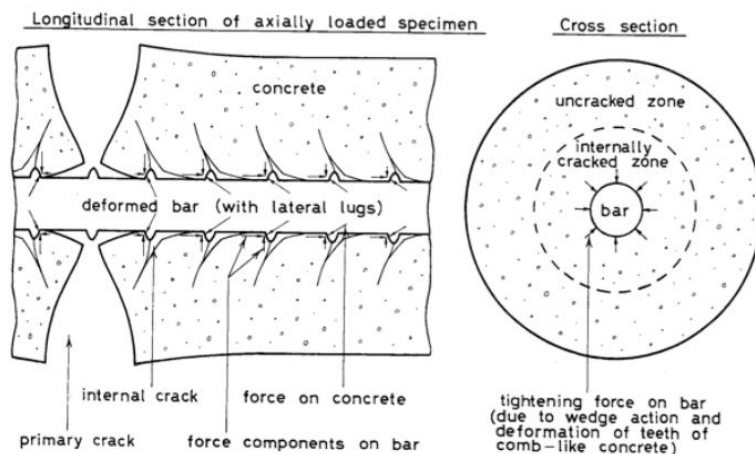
The formation of secondary cracks at the concrete-steel interface.
